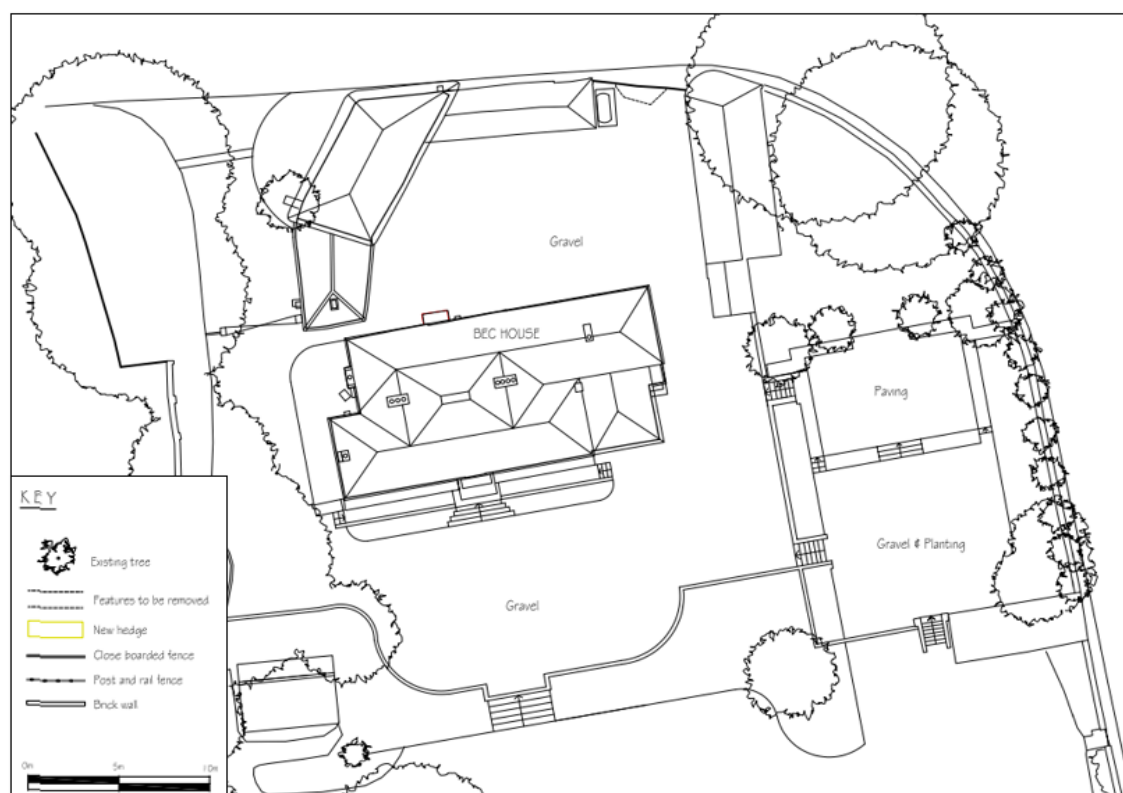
Existing site plan of Bec House and the outbuildings on the northern side (Fowler Architecture and Planning).
